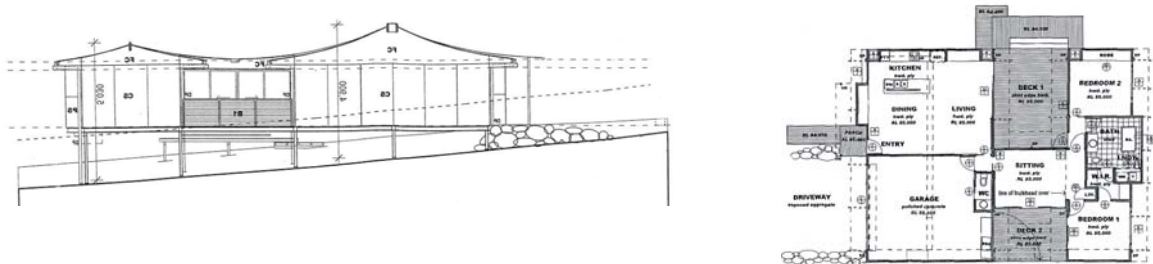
Case study 8 - 140m² single storey elevated, prefab, lightweight clad, metal roof, 2 bedroom, 1 pedestal
